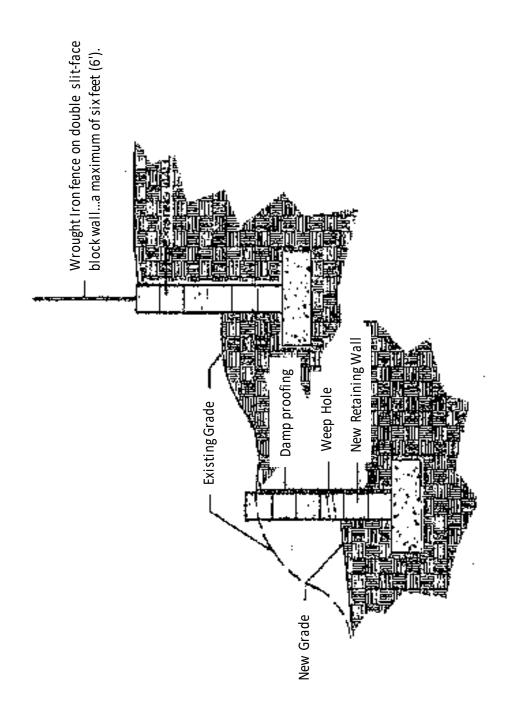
CONSTRUCTION DETAILS - RETAINING WALL
